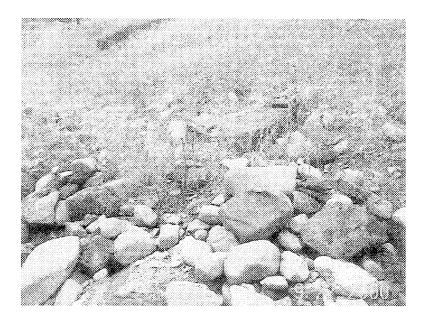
Reseeded west bank with some willow sprouting at end of rock structure.
